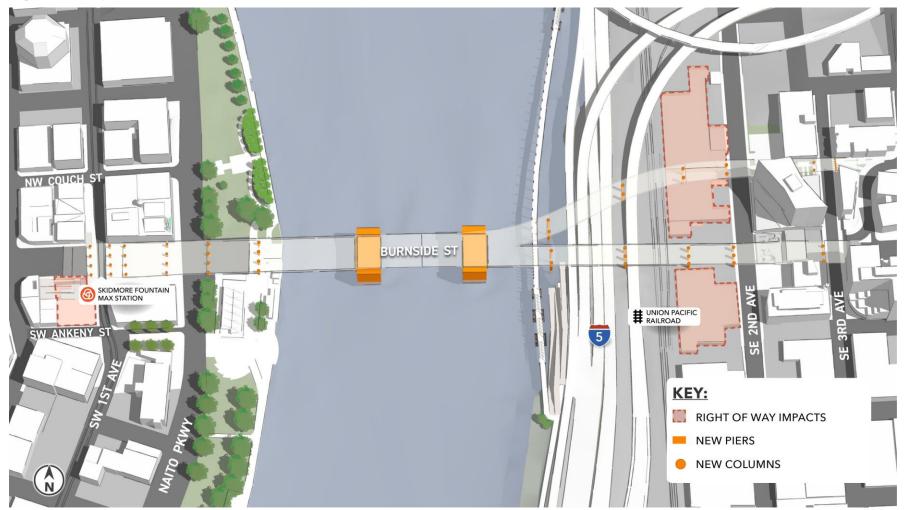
Replacement Alternative with Couch Extension – Pier and Bent Locations
